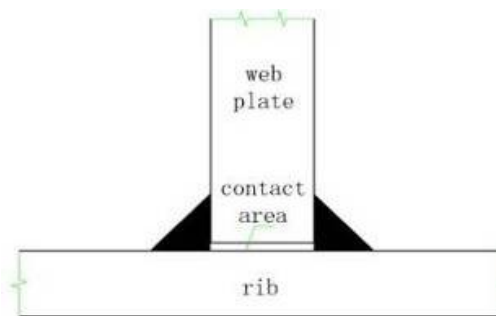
Sketch of rib-to-diaphragm welded connection
